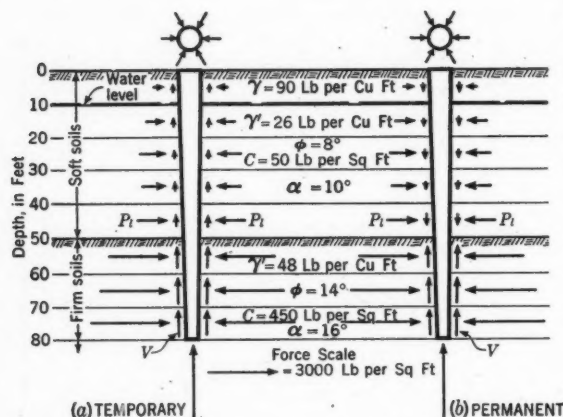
DIAGRAMS OF LATERAL AND SUPPORTING FORCES ON WOOD PILING HAVING 8-IN. TIP AND TAPERING 1 IN. IN 10 FT
